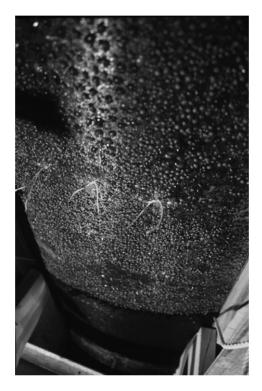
Filtration of excess water and air bubbles through geotextile fabric (C.A.S.T. photo).
